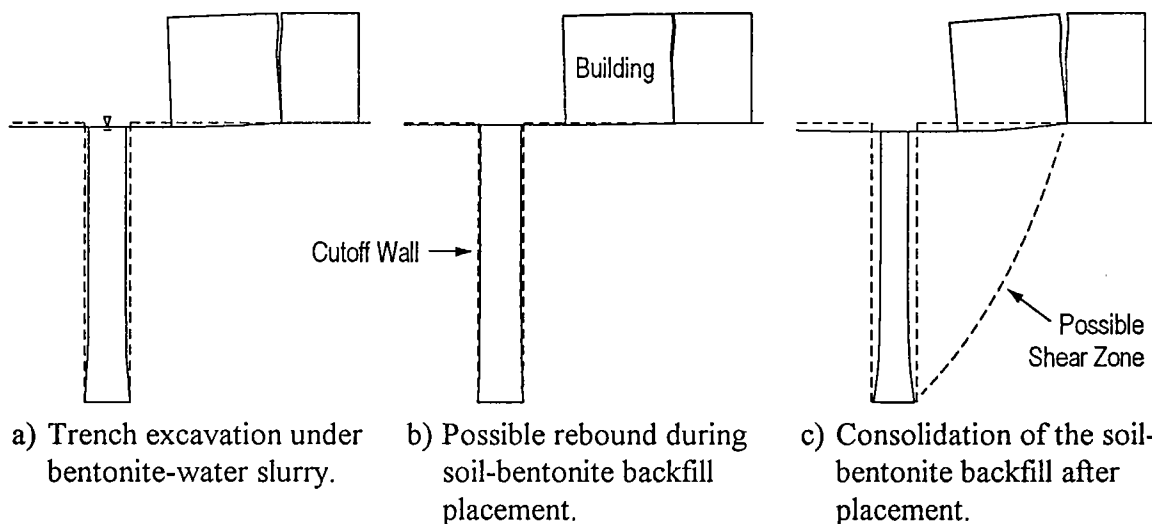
Schematic Diagram of Ground Movements Adjacent to a Slurry Wall
